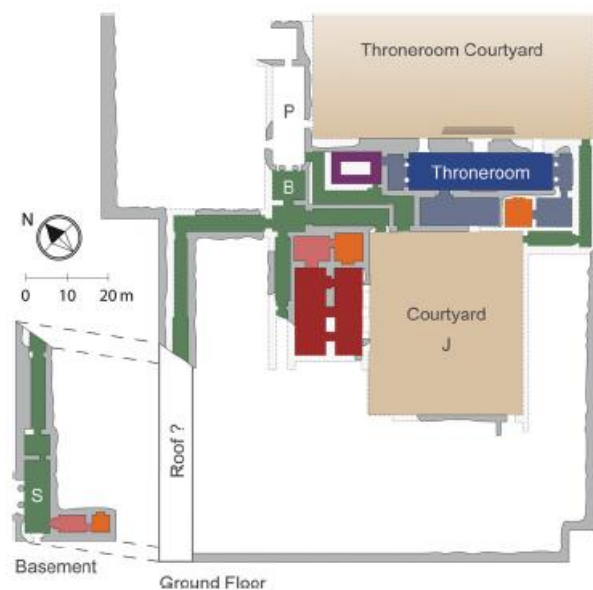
Plan of Ashurbanipal's North Palace at Nineveh.⁴⁹
